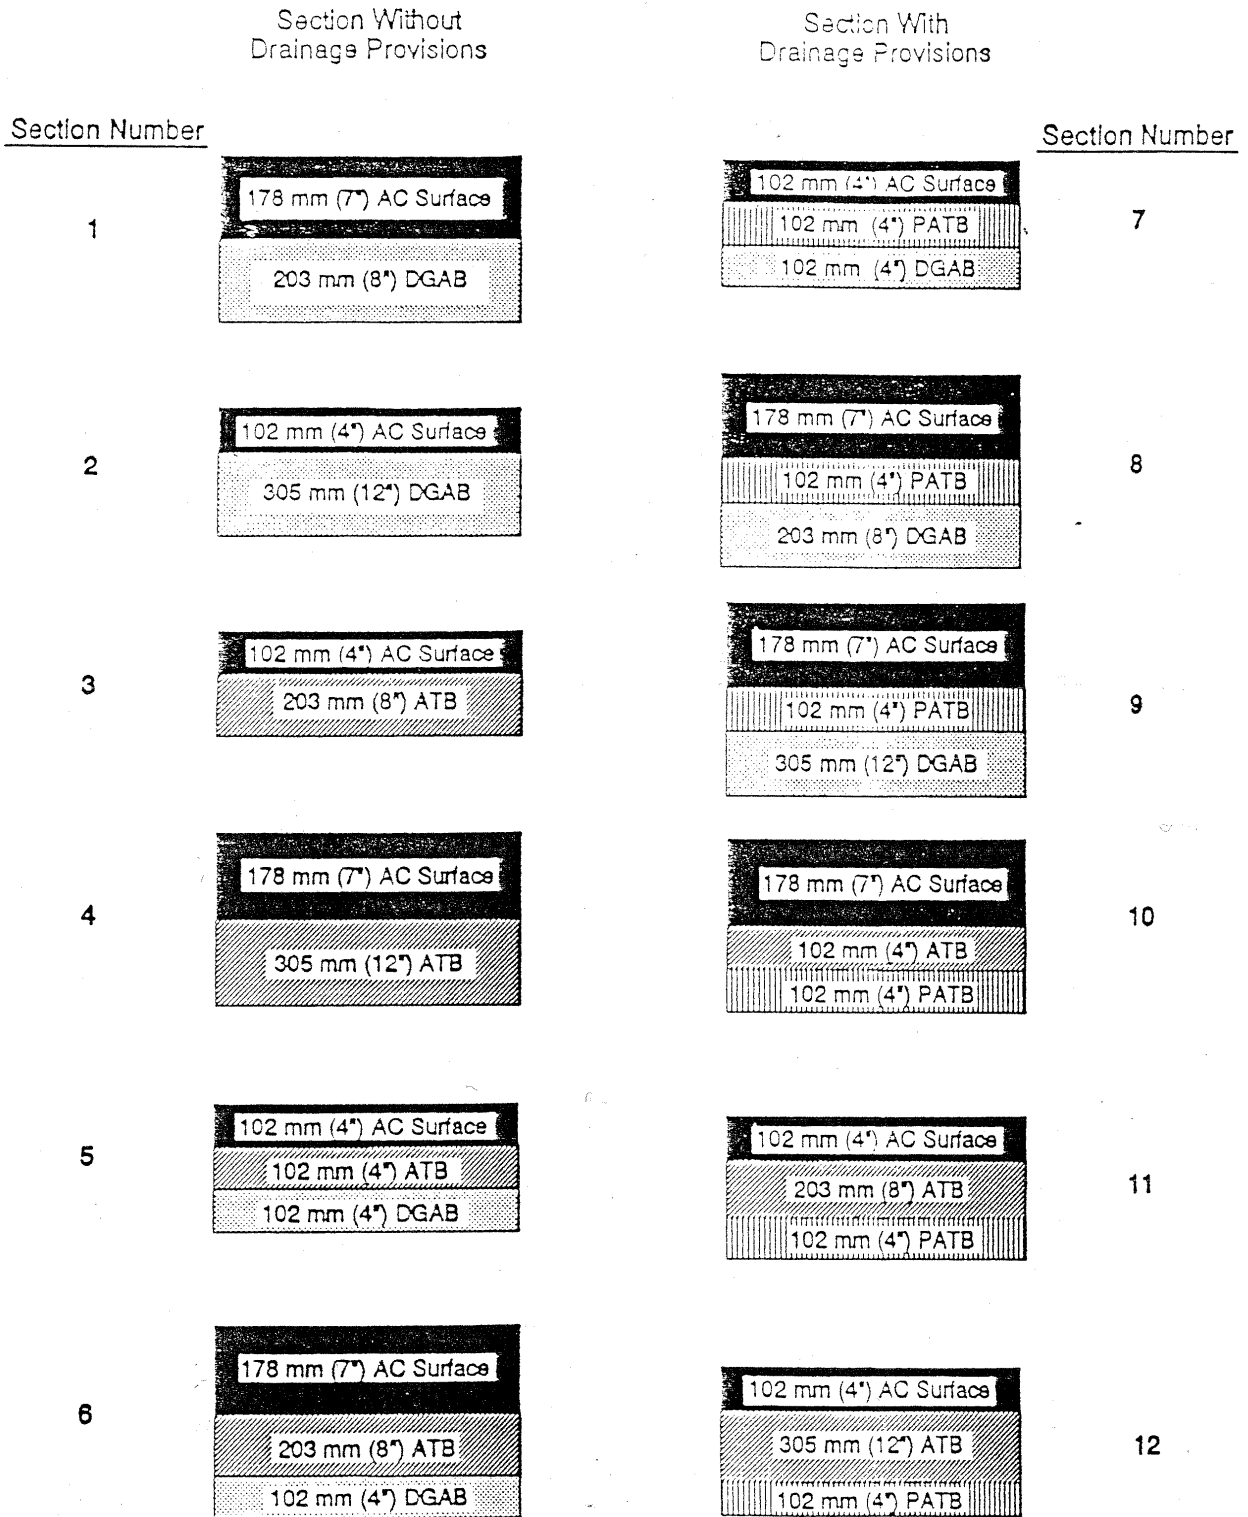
Pavement Cross Sections for a SPS - 1 Test Site with Test Sections 1 through 12
